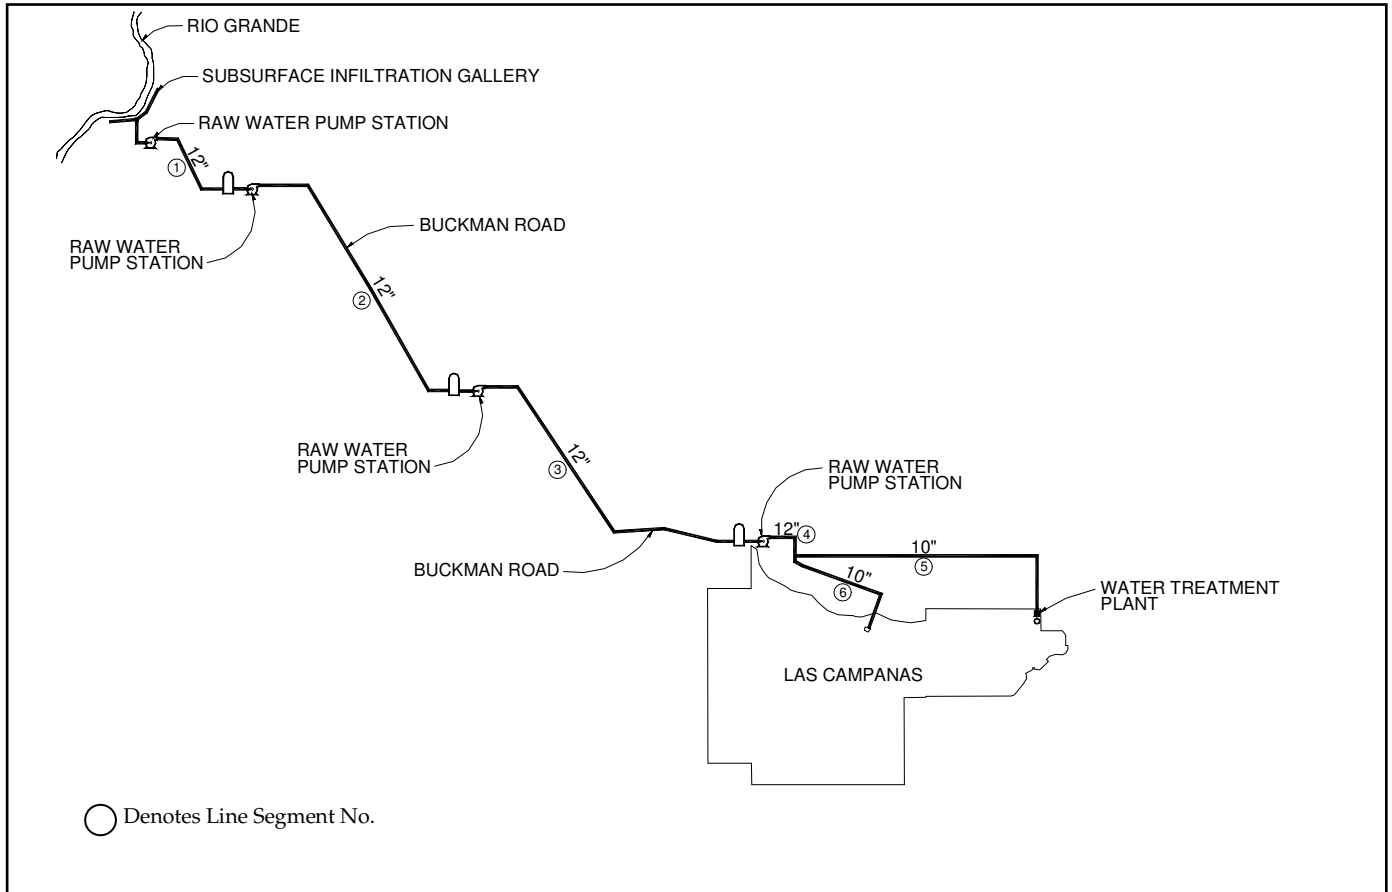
Schematic Layout of Infiltration Gallery Alternative
